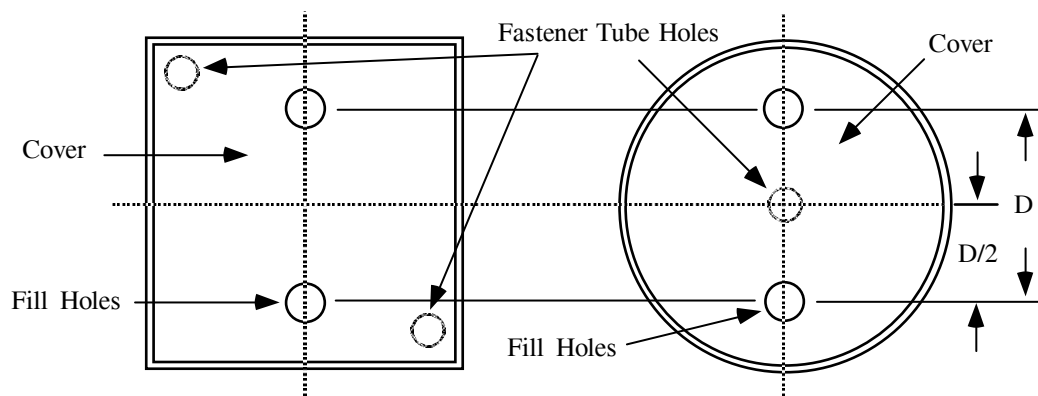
Embedment Fill Holes Location on the Enclosure Cover.
